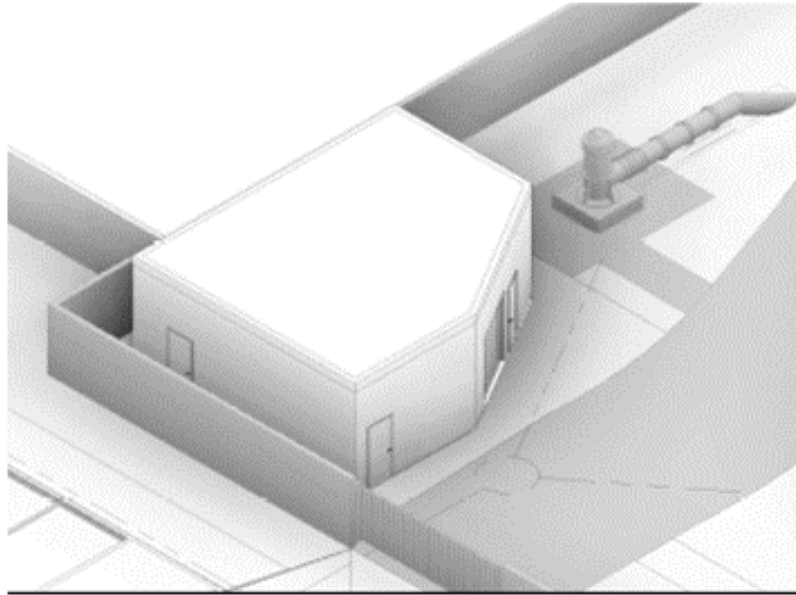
Rendering of the Southwest Storage Building at the MWRF
